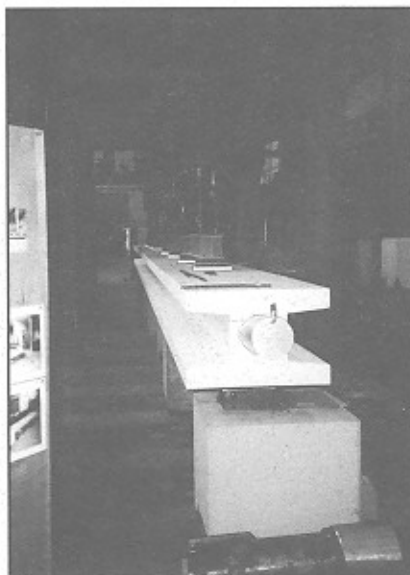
Testing of Continuous Concrete Beam Prestressed with FRP, EMPA, Switzerland
